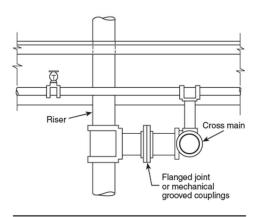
One Arrangement of Flanged Joint at Sprinkler Riser.
